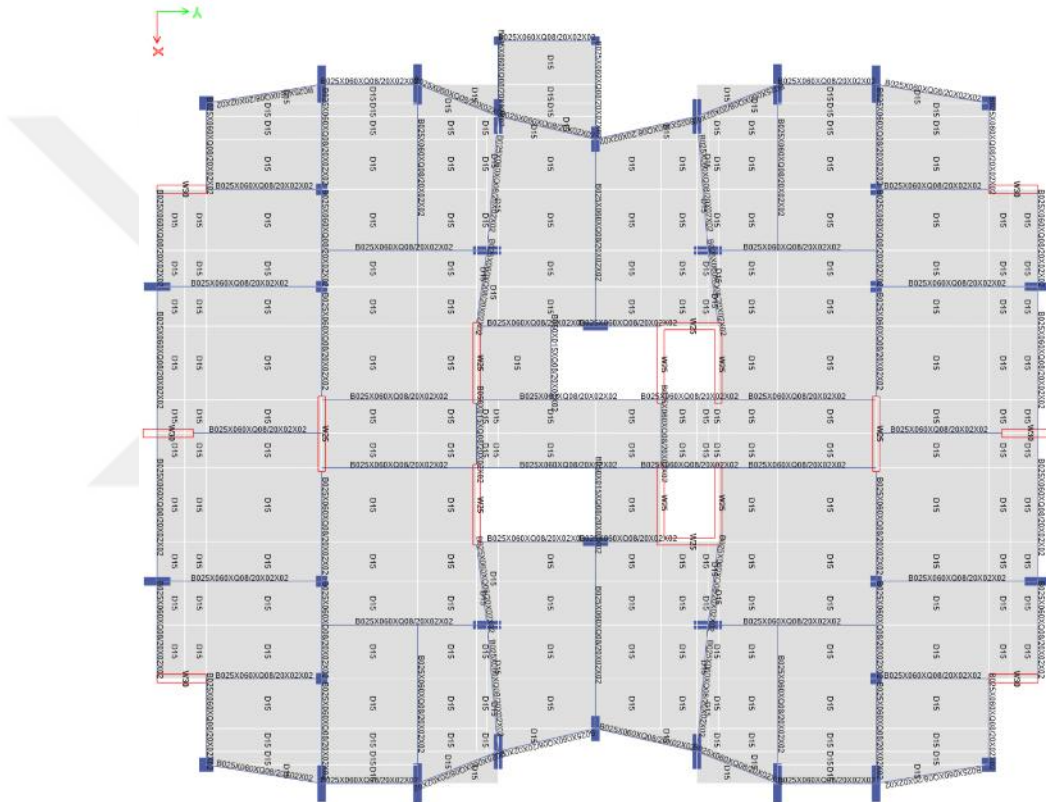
Formwork plan and element sections for the Ground Floor.
